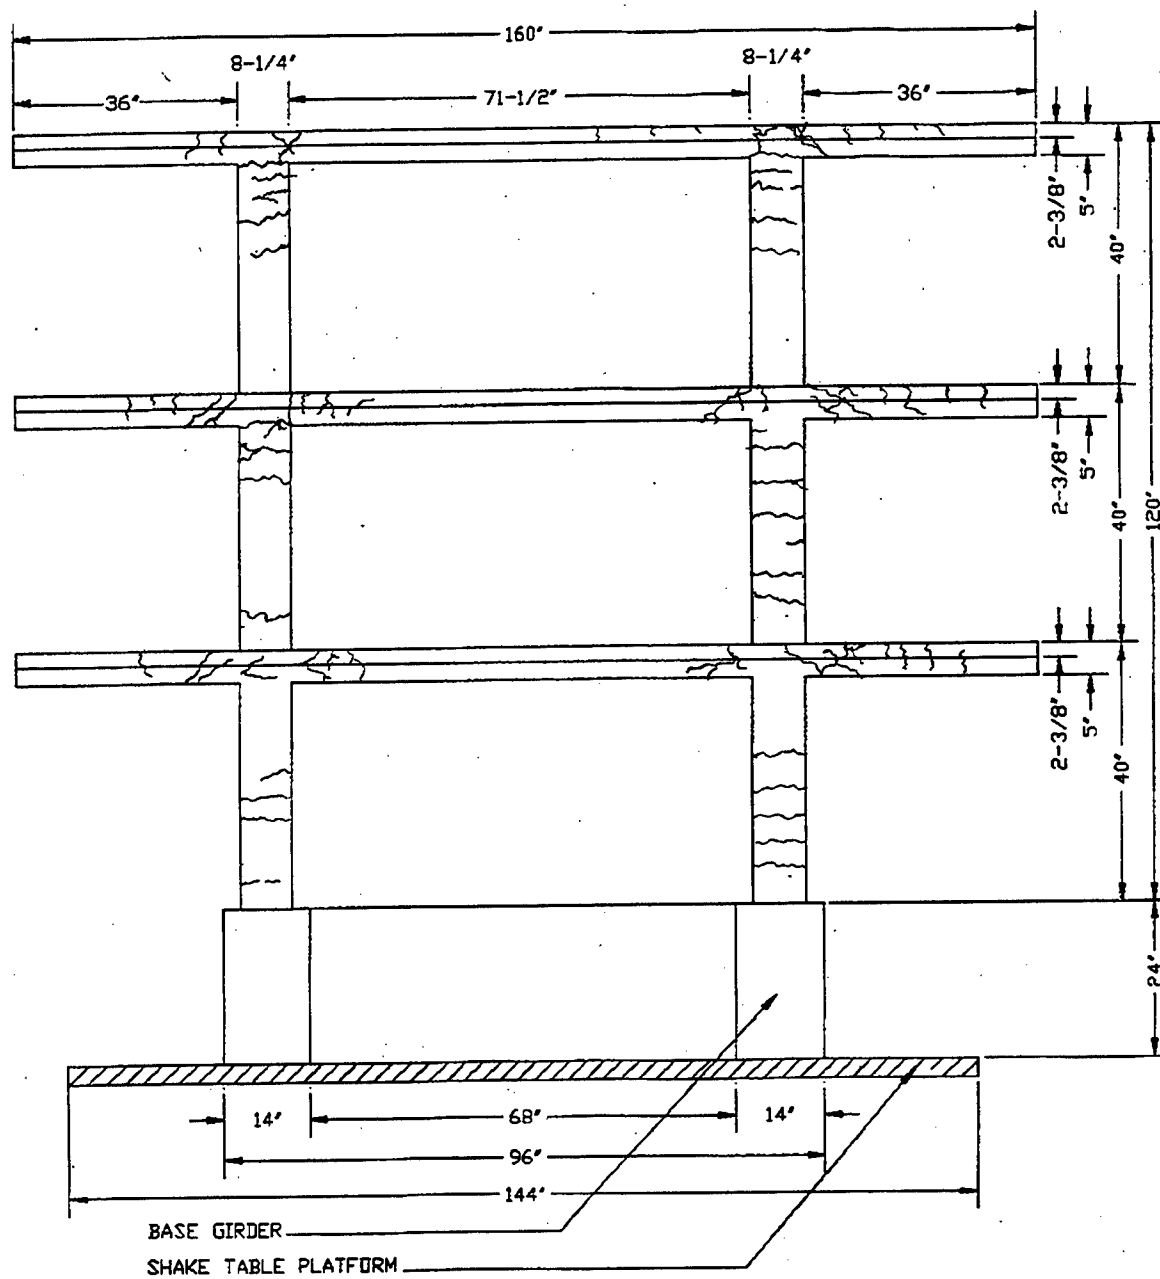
Crack Pattern, North Side of North Columns, Pre-Test
